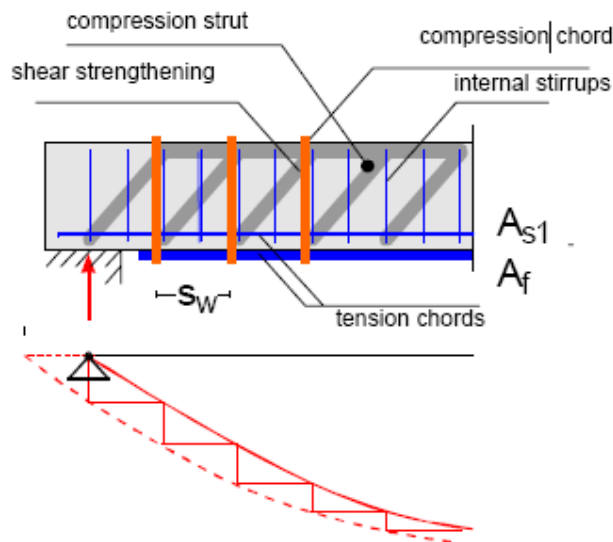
Connection of the FRP shear strengthening to the internal truss structure.
